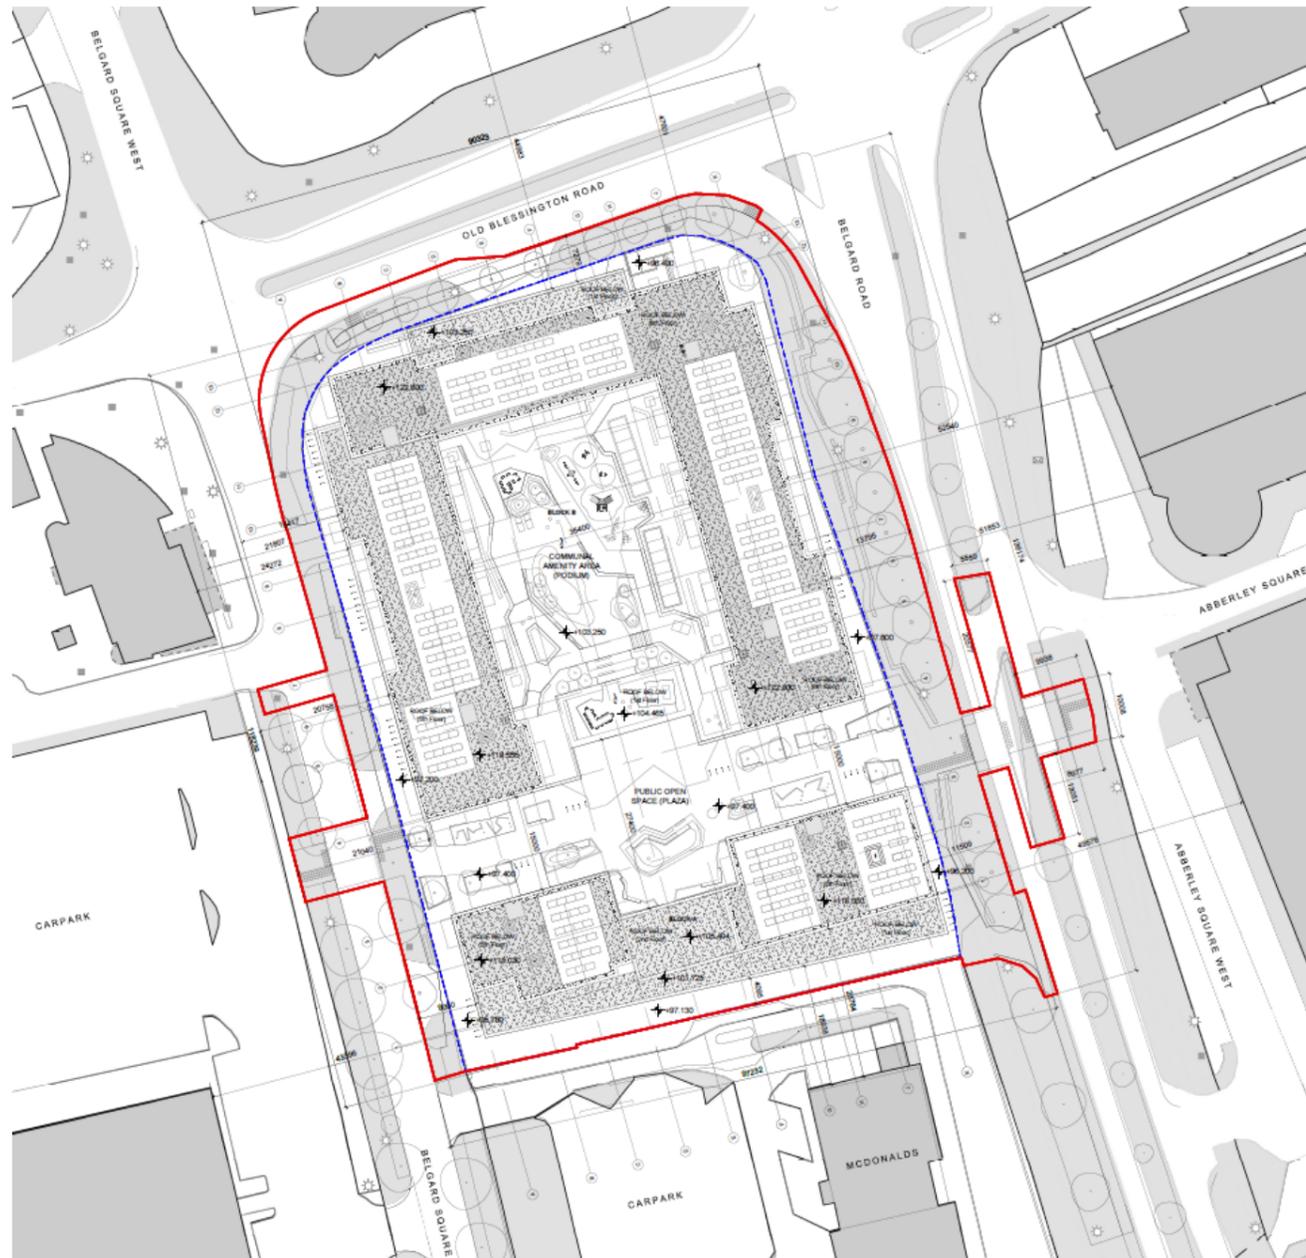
Extract of the Proposed Site Layout Plan (Drawing No. P01_03). Source: Donnelly Turpin Architects
